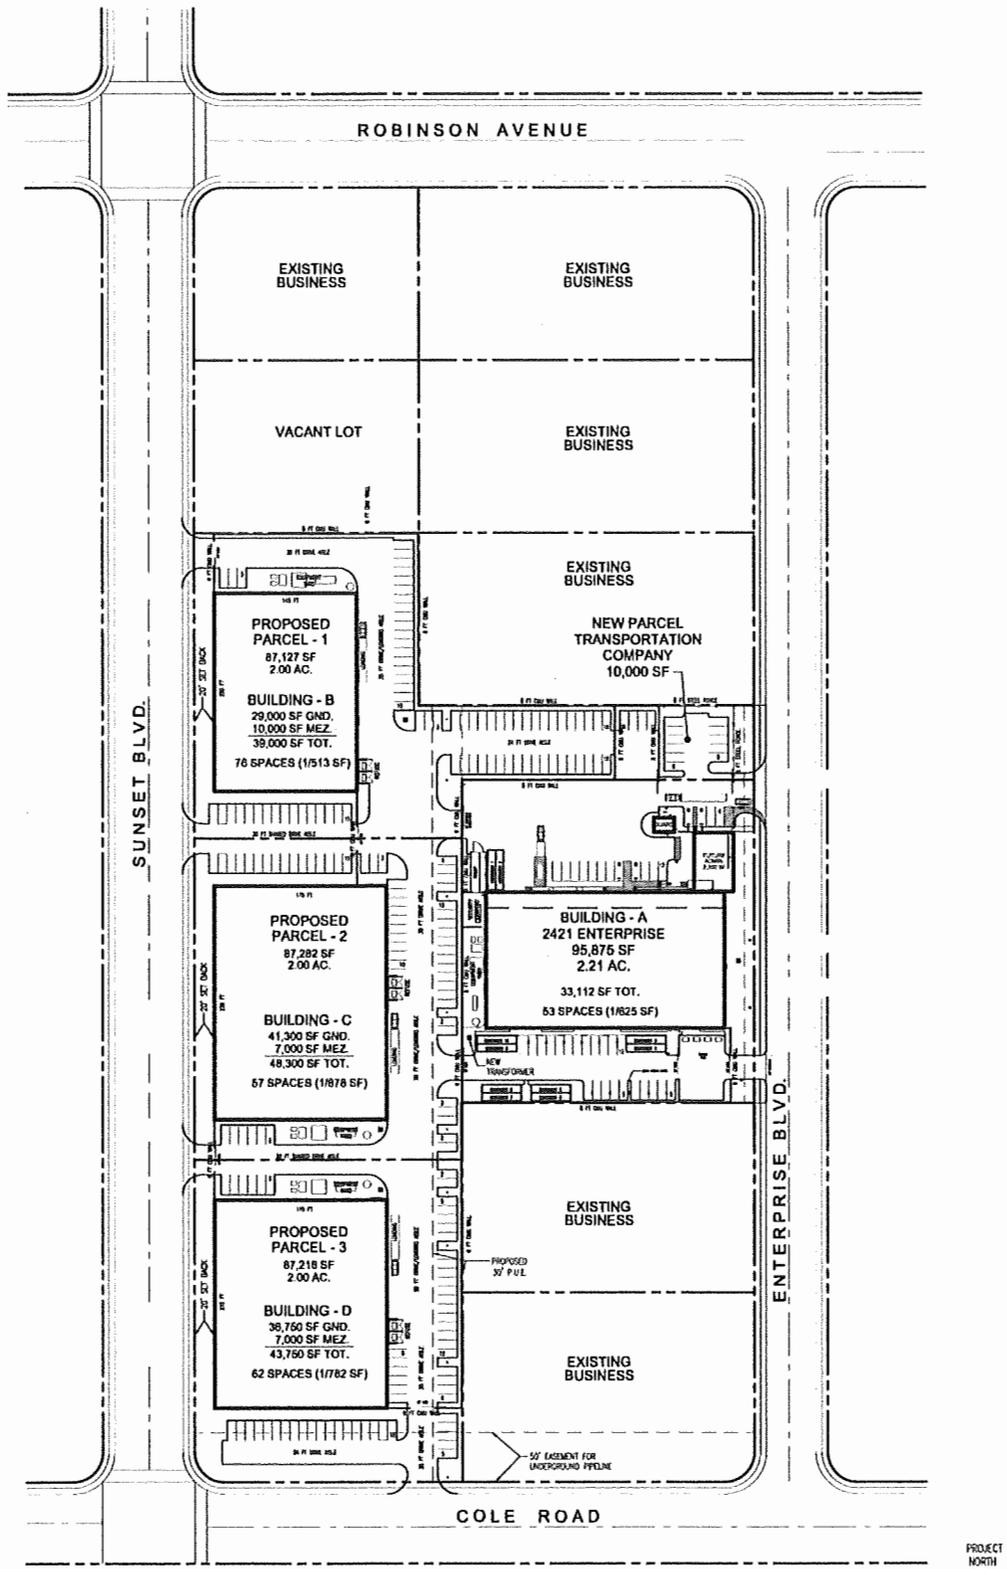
TRINITY CULTIVATION & MANUFACTURING FACILITY OVERALL SITE PLAN
